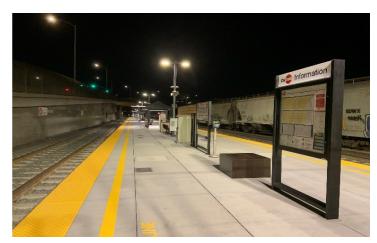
Station Platform South End incl Box Covering PCEP Foundation
